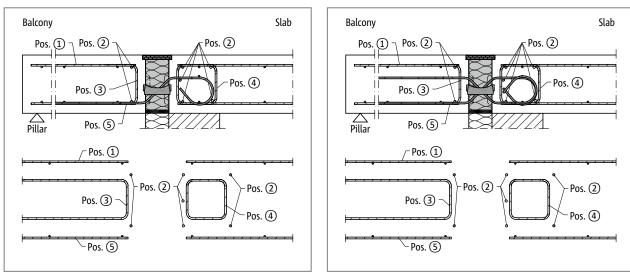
Schöck Isokorb® T type Q-V1 up to Q-V5: On-site reinforcement
